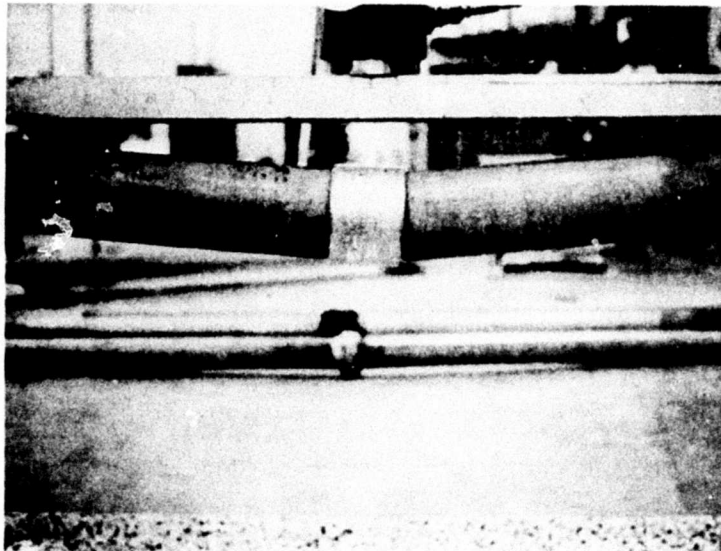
Side view of taper-tapped coupling sample after lateral-stress test.
